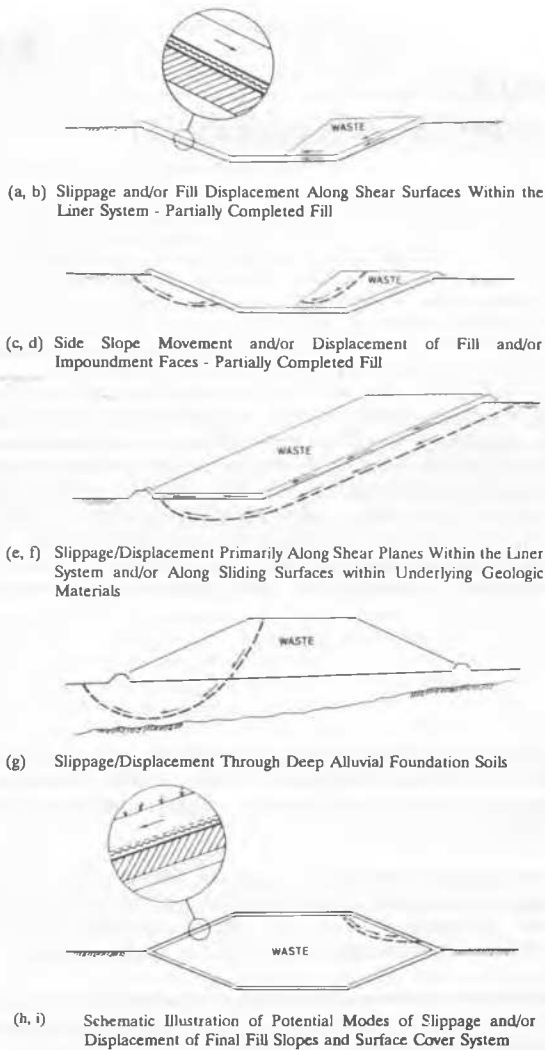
Schematic Illustrations of Examples of Potential Waste Fill and/or Foundation Failure/Slippage Modes
